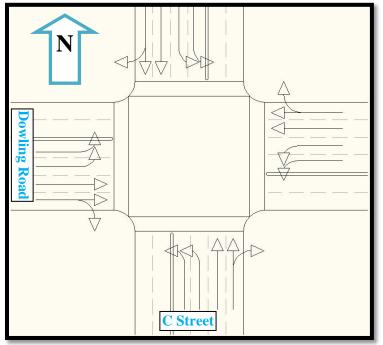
Selected Alternative Geometry at Dowling Road and C Street
